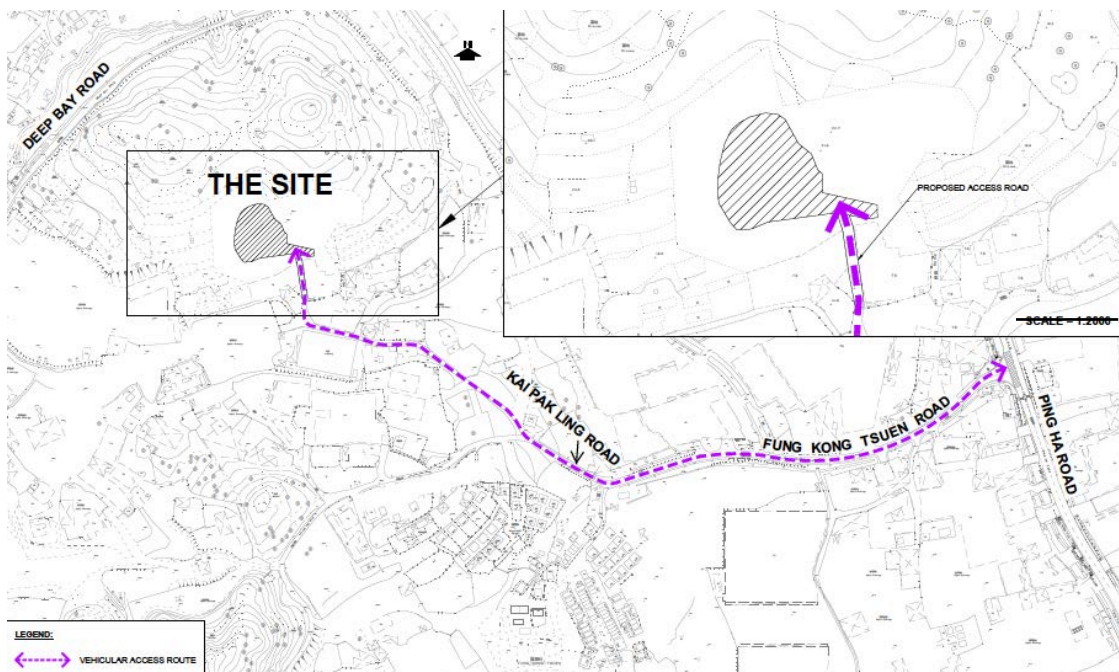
Site Accessibility from Fung Kong Tsuen Road
